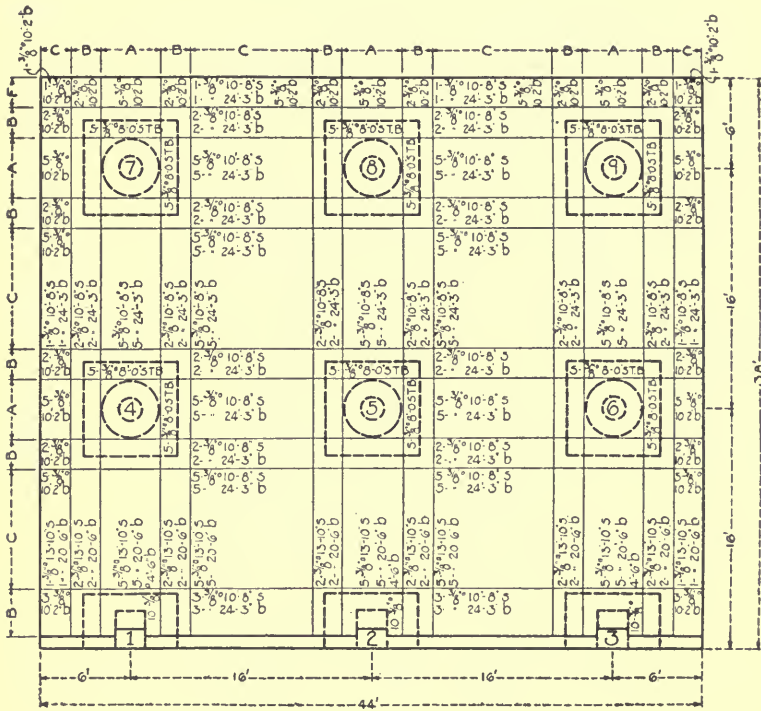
REINFORCING PLANS FOR SLAB S.
